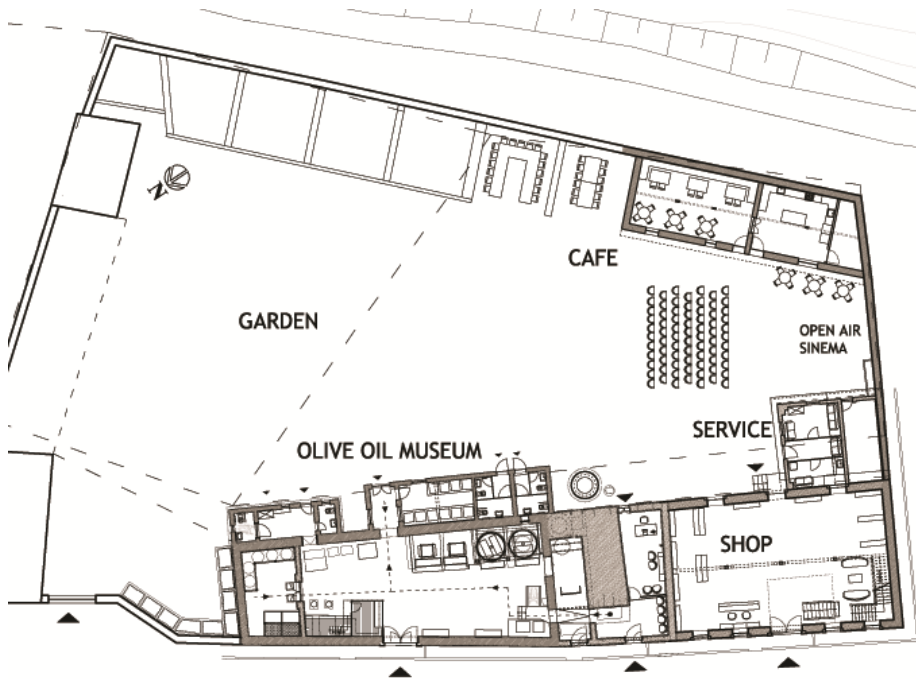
Site plan of factory complex – museum, shop, office, café, garden.
